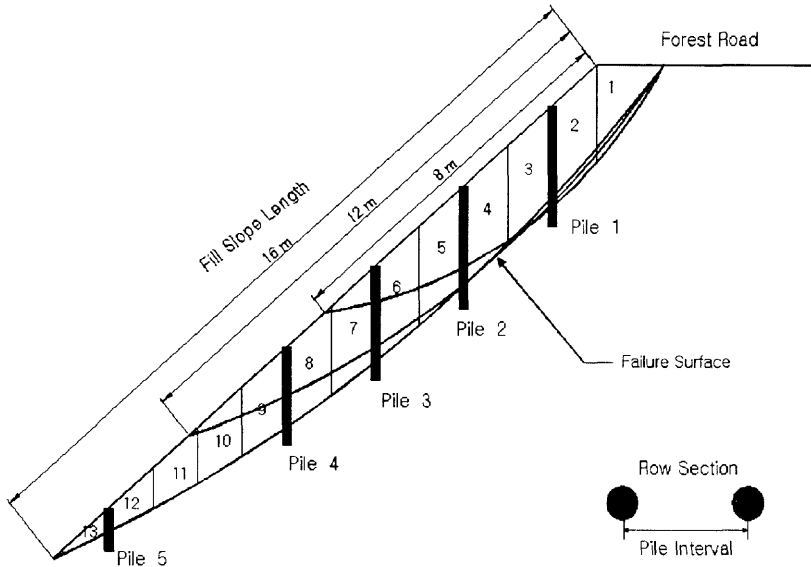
Schematic diagrams for foundation point of timber piles by fill slope length.
